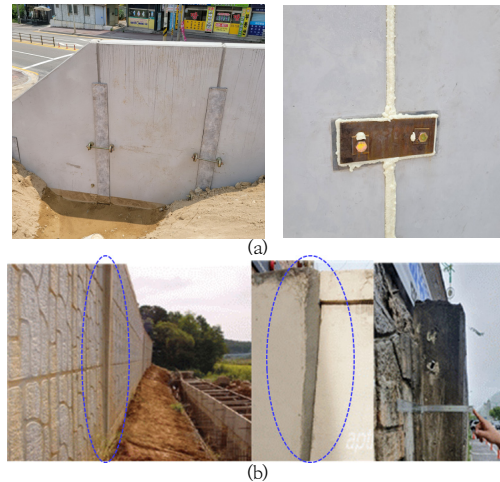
Existing horizontal connection method and problem of precast concrete segment (a) Existing horizontal connection method (b) Appearance of unequal displacement
